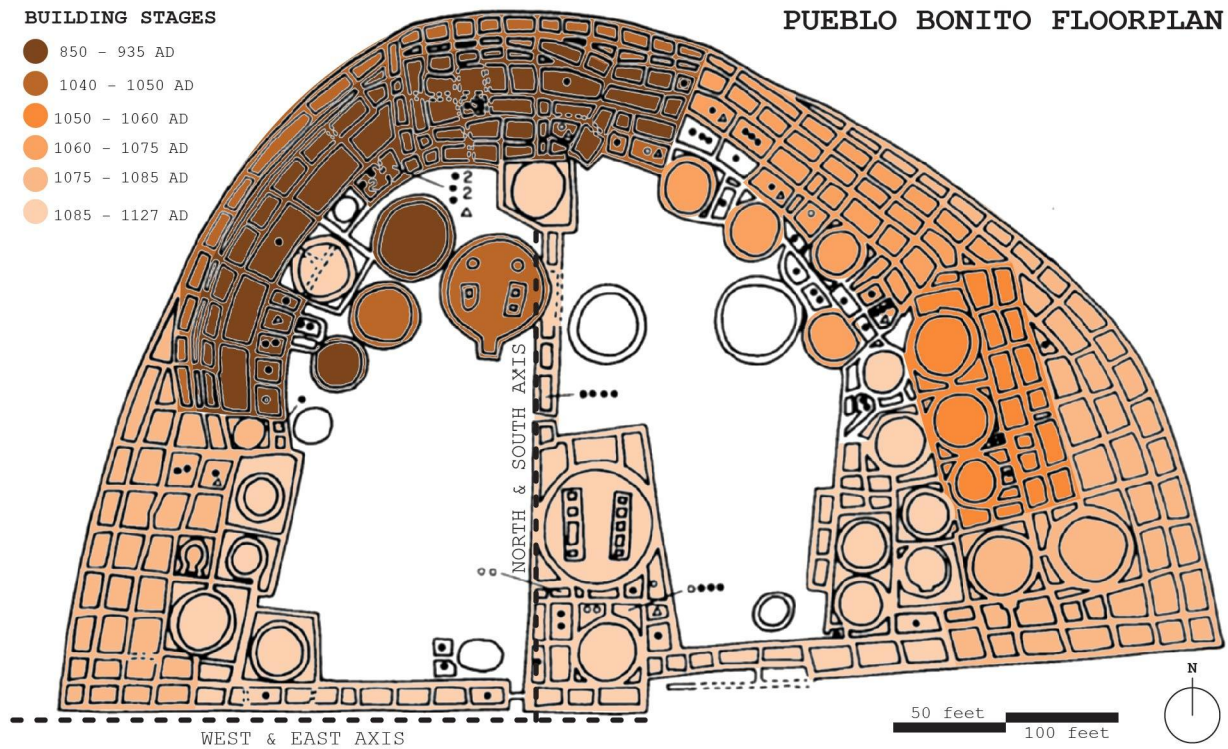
Ancestral Puebloans, (drawing: Tunnell) floor plan with evolutionary construction stages & cardinal direction alignment, Pueblo Bonito, Chaco Canyon, NM, 850-1150.
